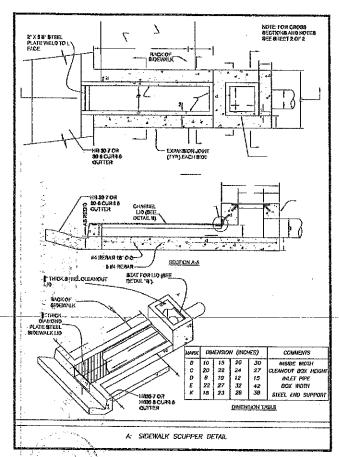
FOR: CASA DE HOT SPRINGS LOCATED IN SECTION 28, T415, R13W, SLB.RM. & IN SECTION 23, T415, R13W, SLB.RM.
